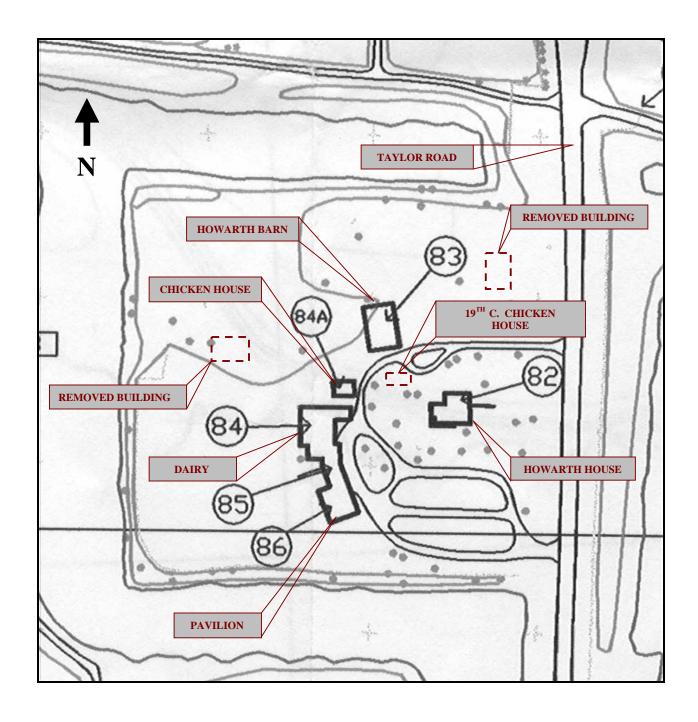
Site plan of the Howarth Farmstead, showing existing conditions (Basalay, Cary, and Alstadt 2001). The building identification numbers used on the map refer to the master plan for Wildlife Prairie State Park.
